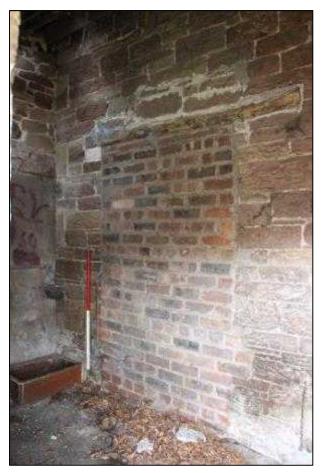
Link Building A/B, interior, east elevation (Feature 103)
